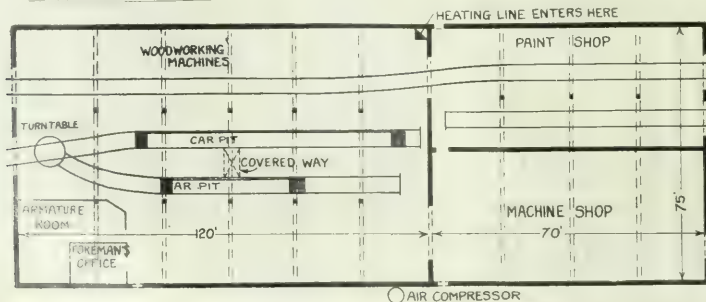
Plan, showing general layout of repair shop, Calgary Municipal Railway System
